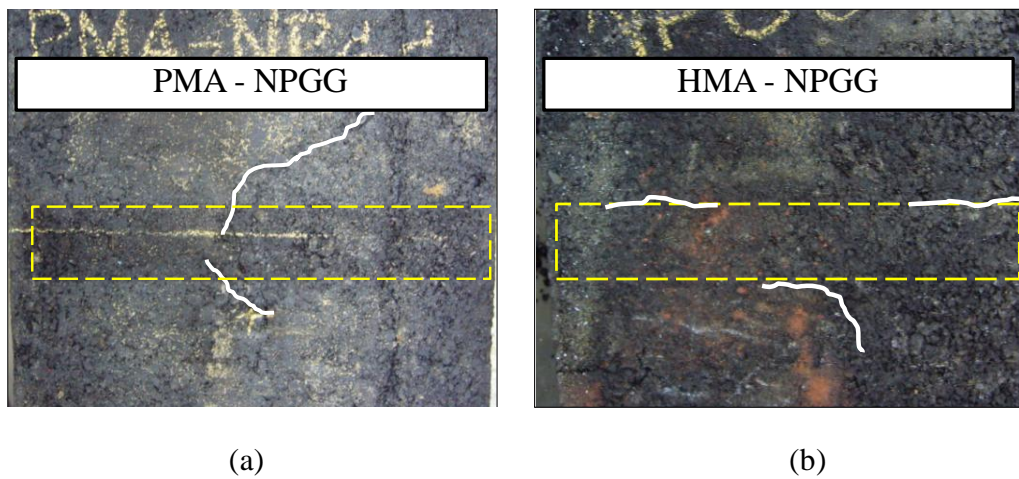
Surface cracking in new reinforced with geogrid pavements: (a) PMA pavement; and (b) HMA pavement
